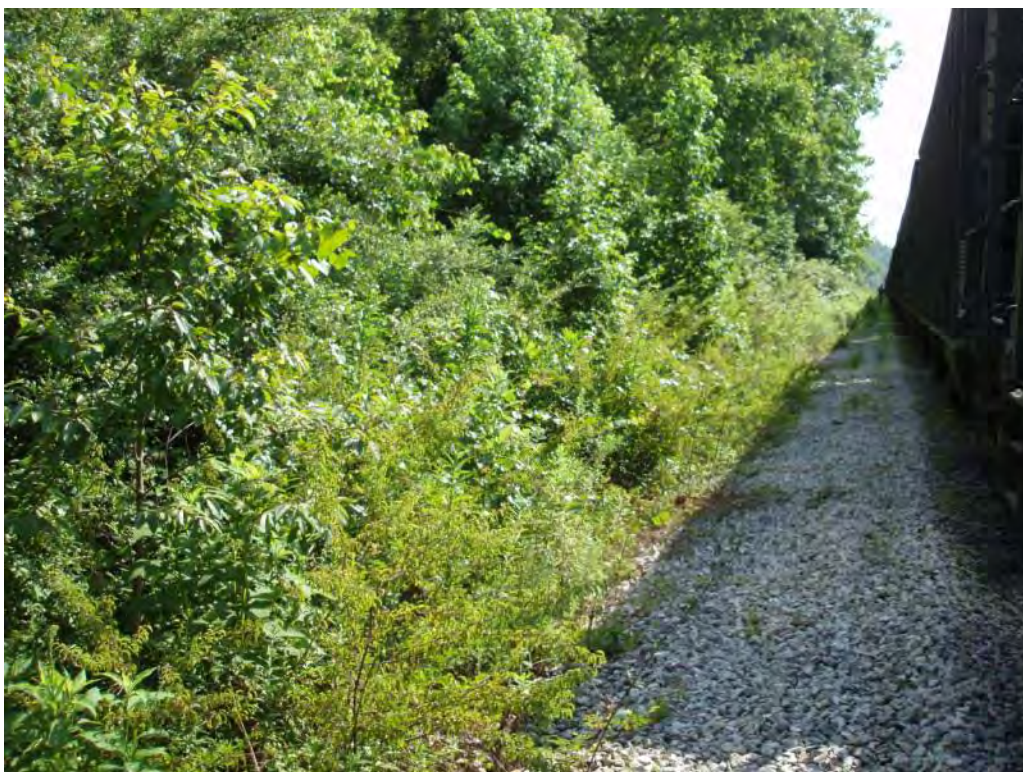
Scrubber Waste Pond – West embankment exterior slope. Looking at minor
